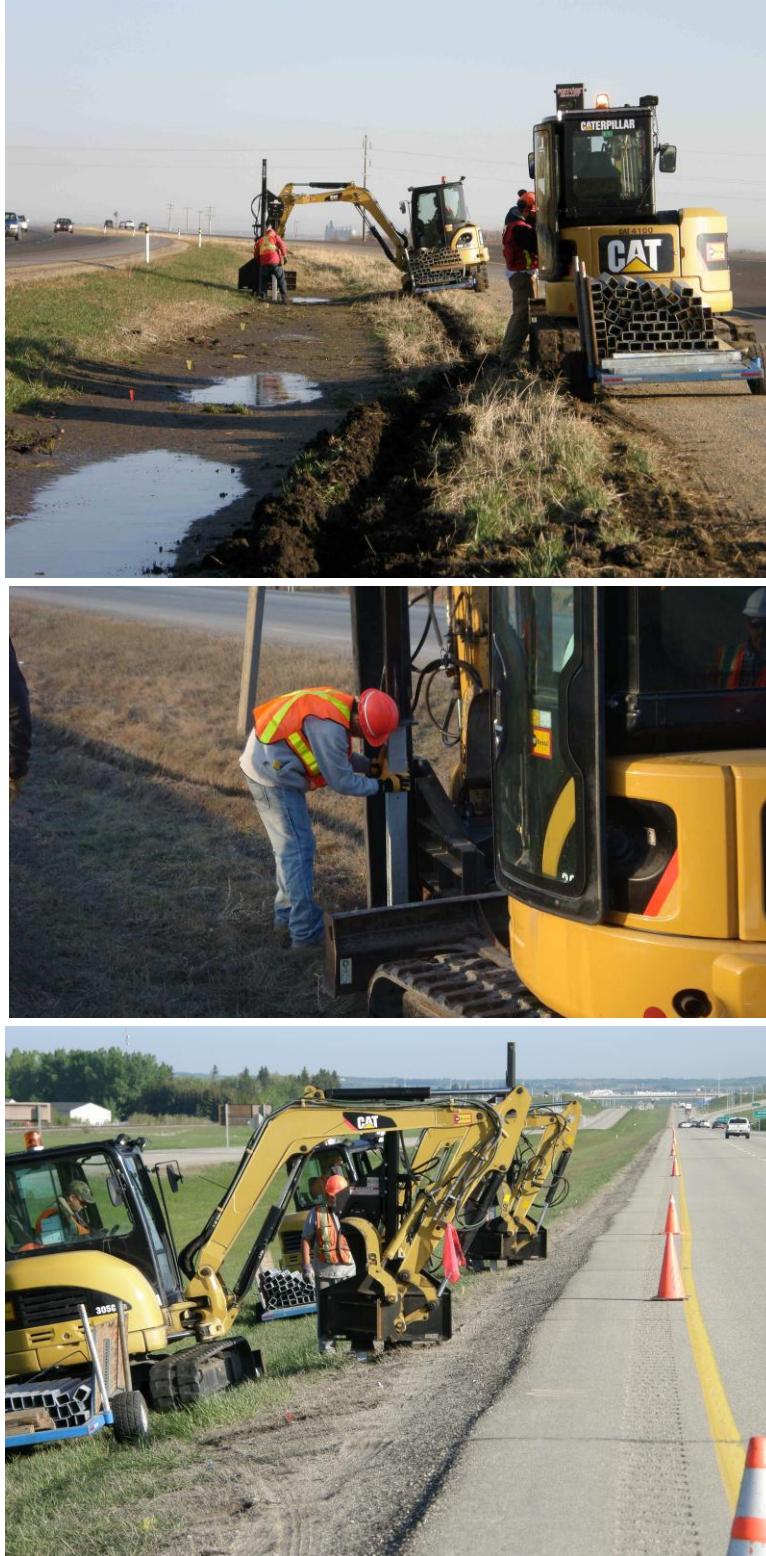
Top to bottom: Installing driven steel sockets; Checking angle of post during vibratory driving of steel sockets; Vibratory driver attached to mini-excavators.
